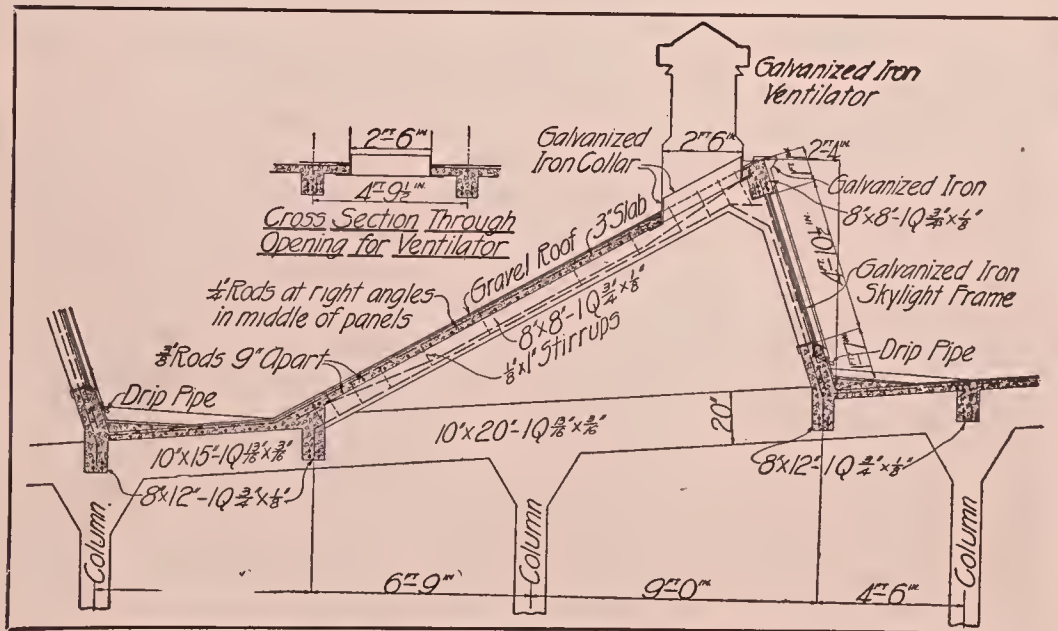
Cross Section Detail of Saw-Tooth Roof.
